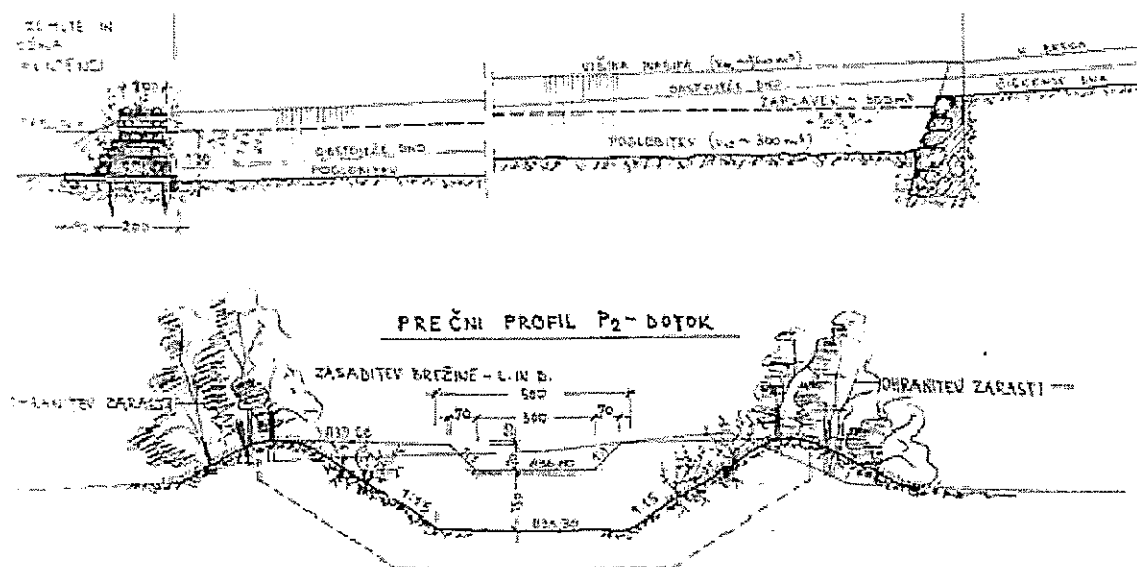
Gravel barrier: top longitudinal cross-section, bottom transversal cross-section.
